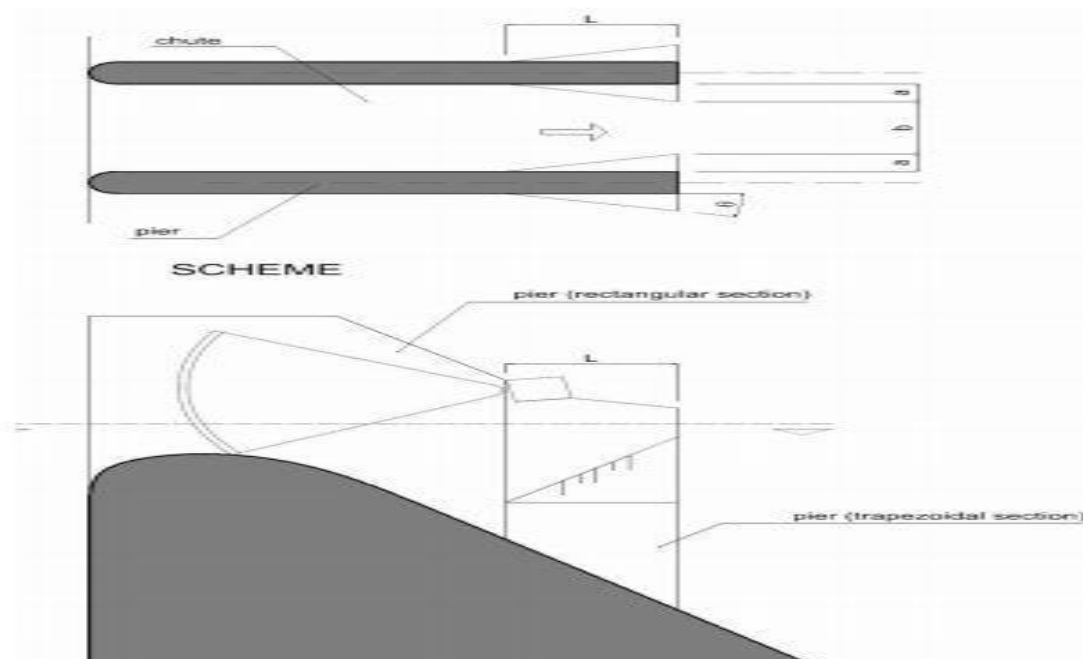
The above figure shows the Scheme and typical sections of Flaring Pier
